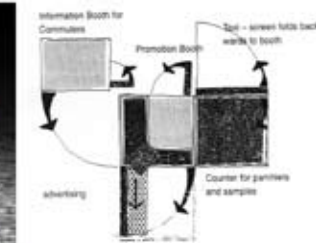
TAXI RANK INFORMATION PAVILION PLAN
